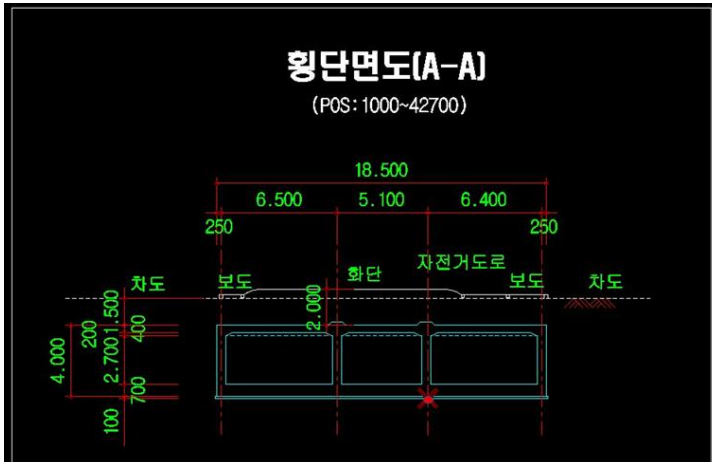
Character marking for the location and width of the cross-section of the underground parking lot
